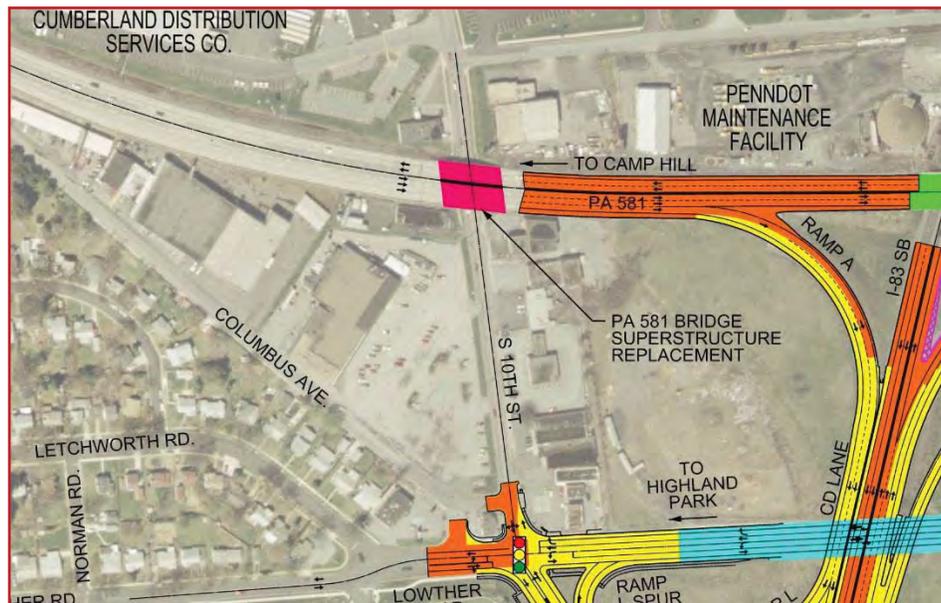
The Existing Bridge Location, Precasting Location, and Transportation Route
